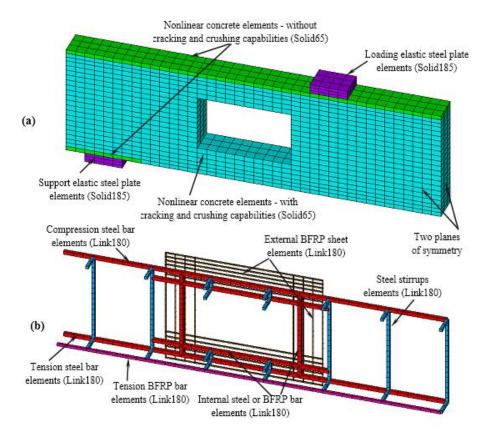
3D FE model for a typical quarter of the tested beams: Concrete and steel plates solid elements (a) and reinforcing steel and BFRP bar and BFRP sheet elements (b).
